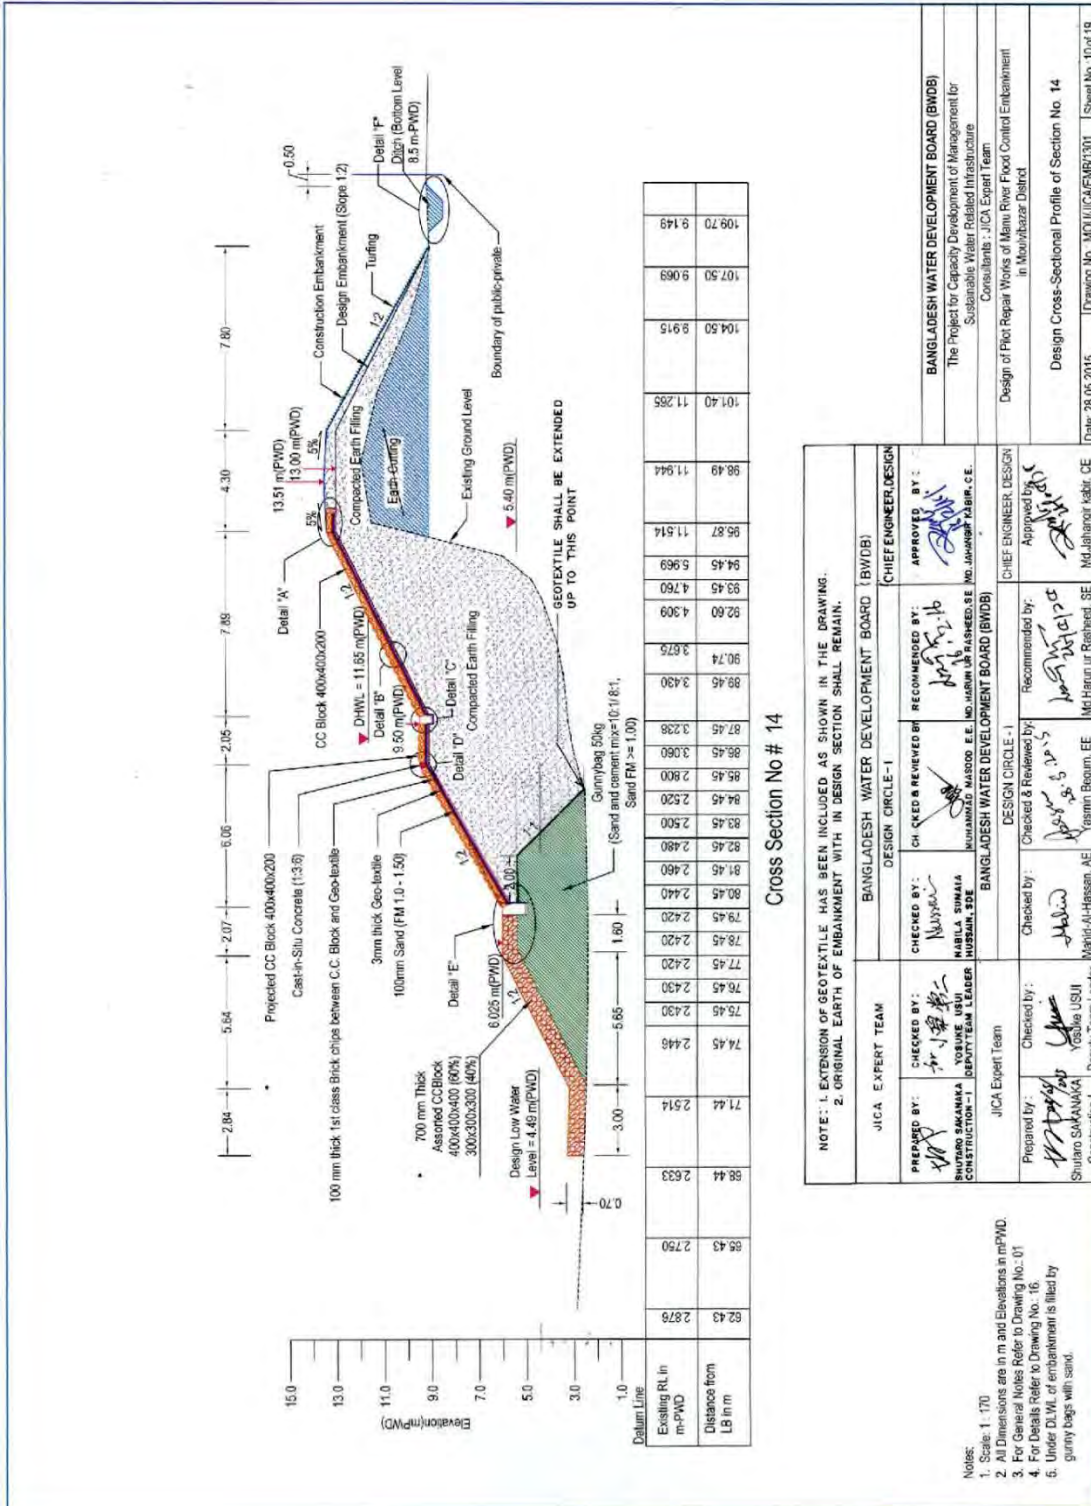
Typical Cross Section Profile (Pilot Repair Works)
